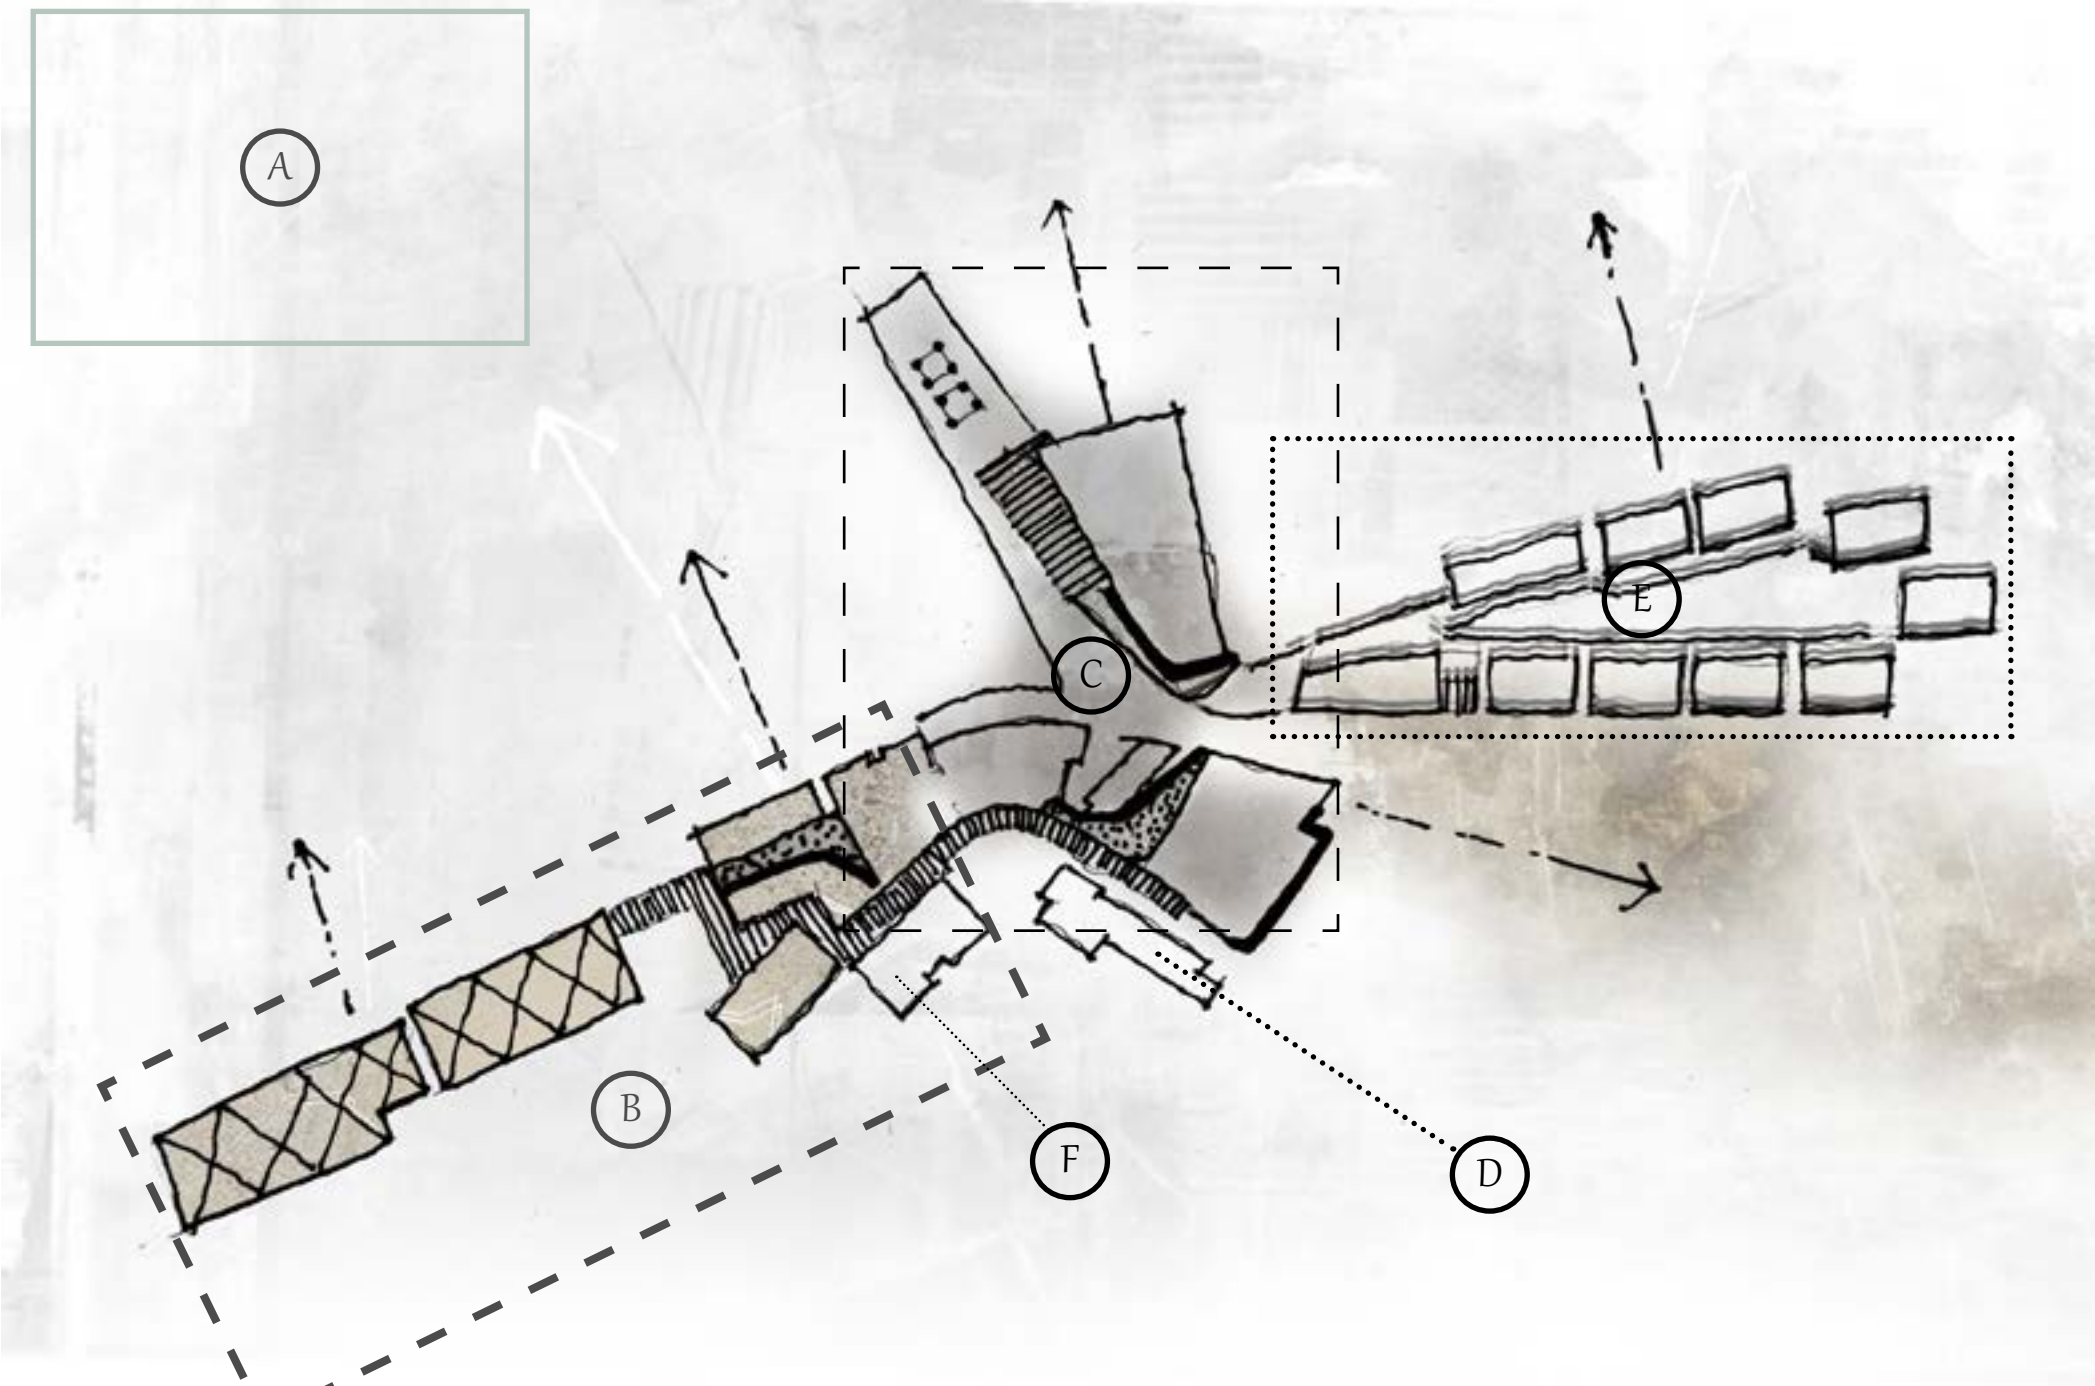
Floor plan divided into parts (Author, 2021)
